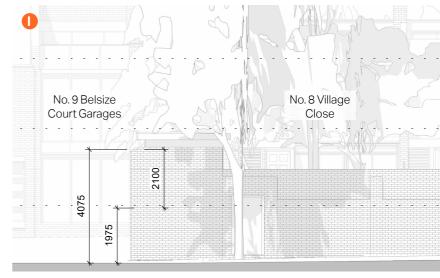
No. 8 Village Close South East Boundary Wall Elevation
